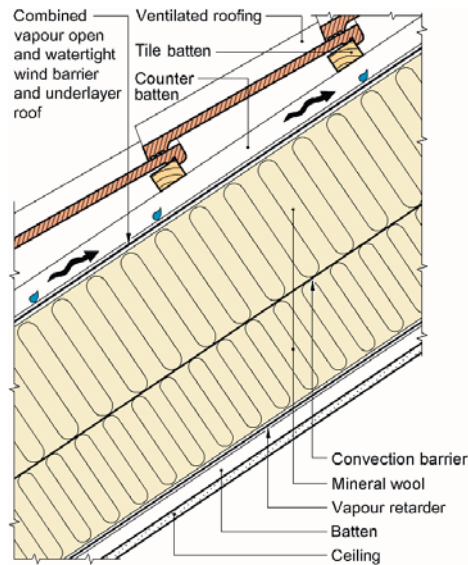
A convection barrier is recommended also for pitched wooden roofs when insulation thickness exceeds 200 mm.
